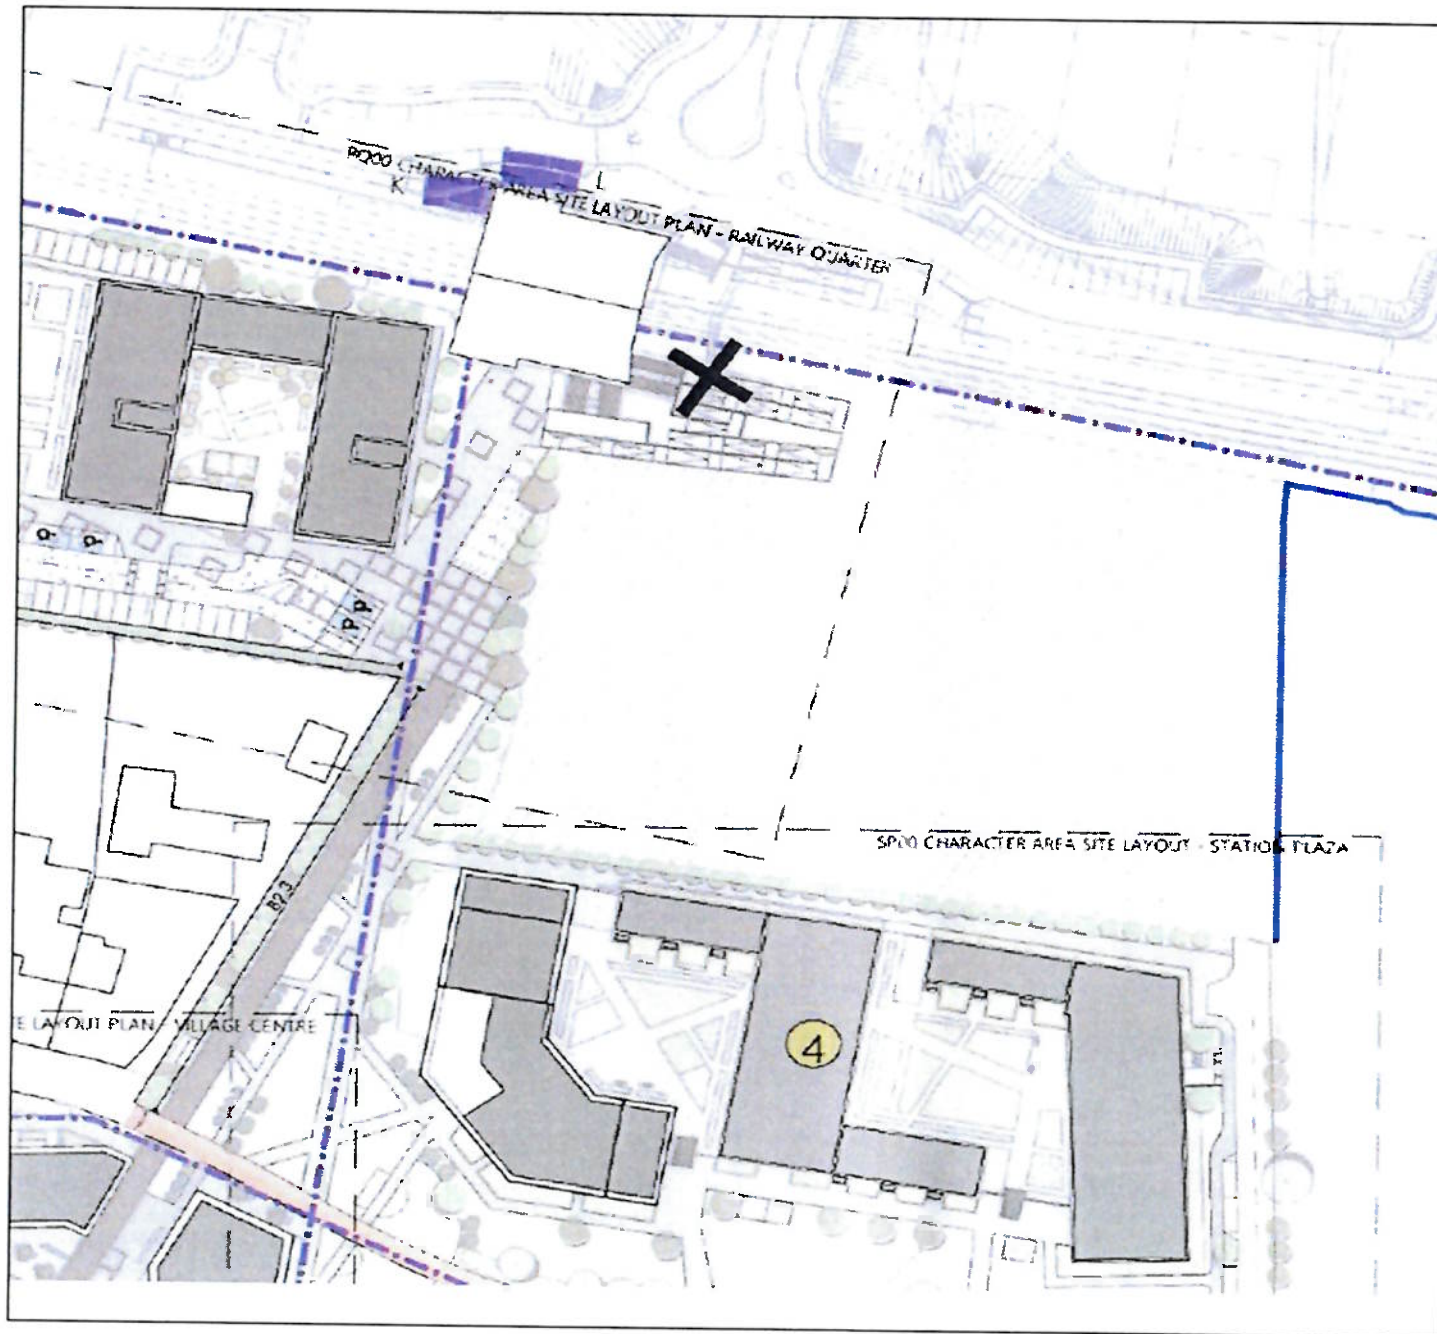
Proposed access ramp at Hansfield Station as part of Barnhill Garden Village SHD
